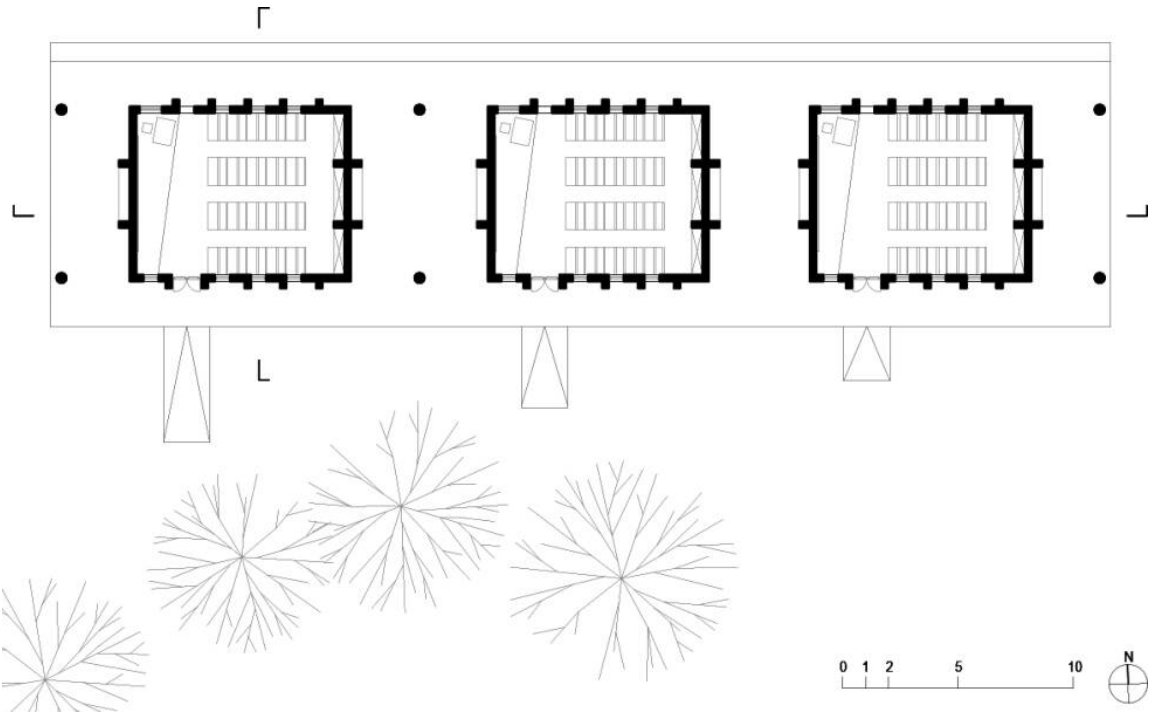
Floor Plan of Gando Primary School (Cardenas, 2016)
